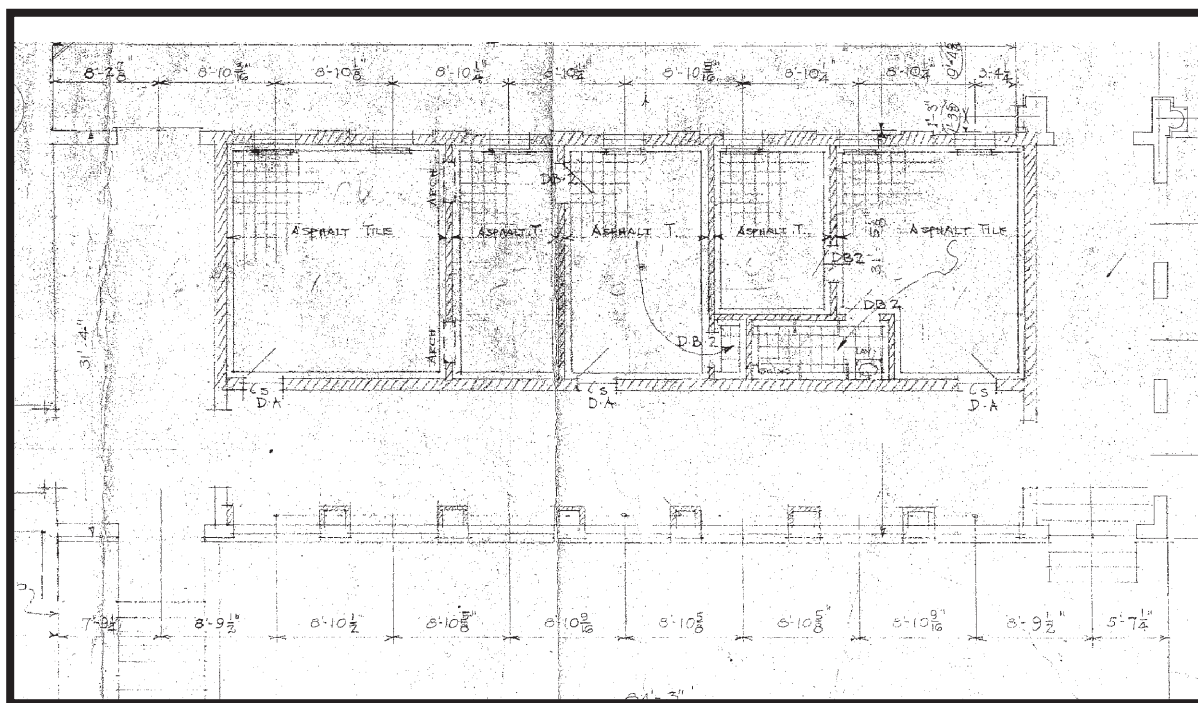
Stanislaw J. Makielski, detail of ground-floor plan showing the southeast wing.
